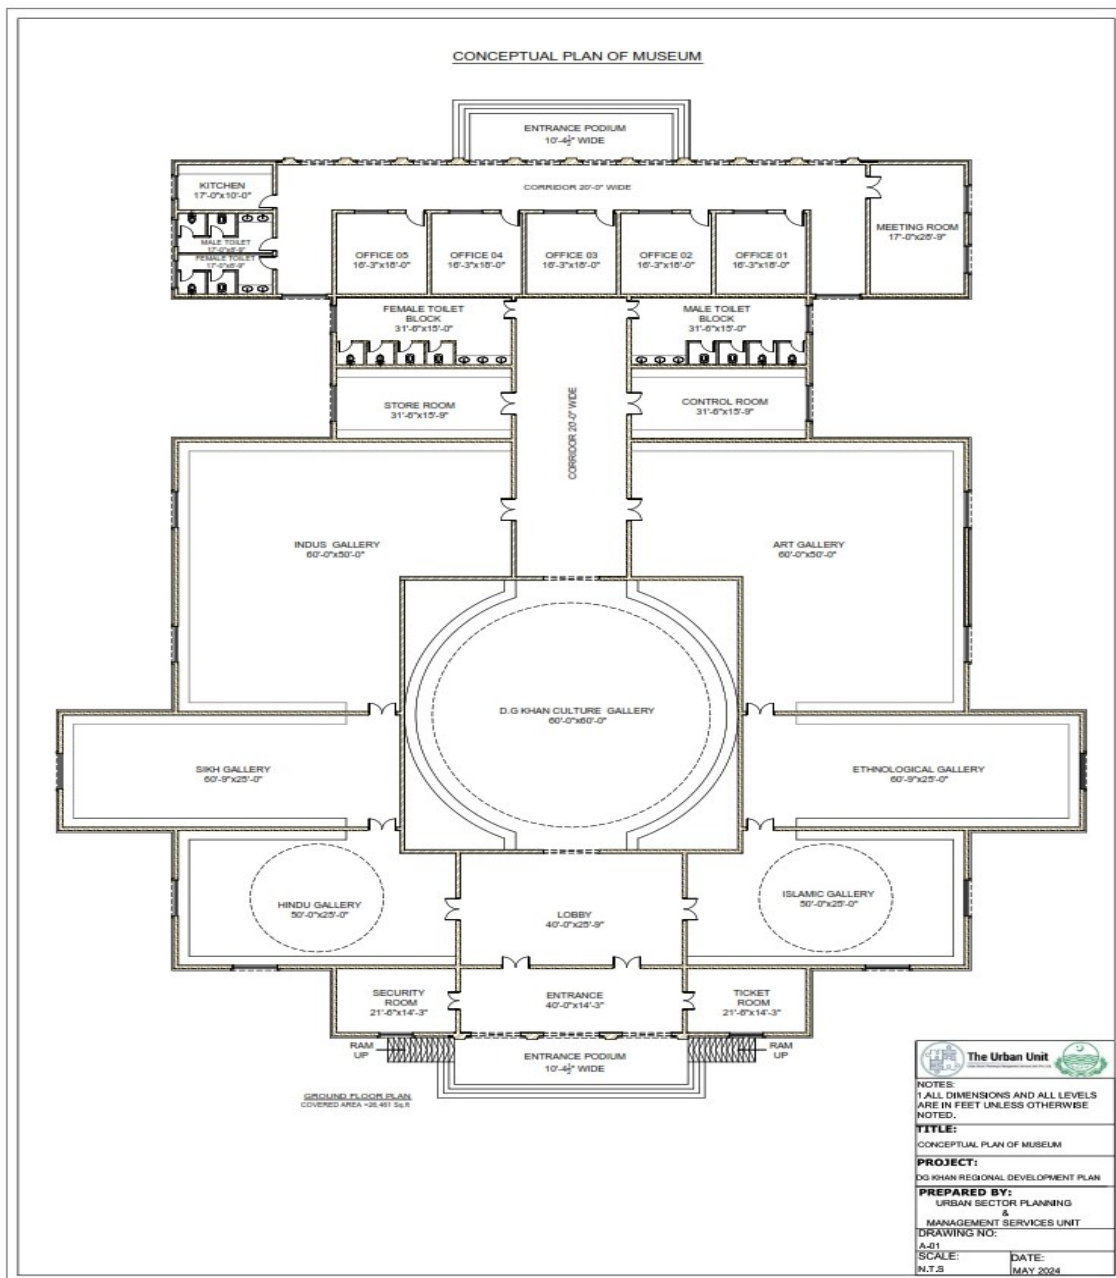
Conceptual Base Plan of Proposed Museum Building in D.G Khan
